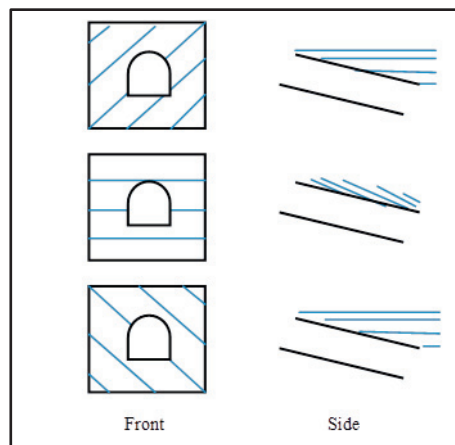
Geological structure and tunnel orientation for support recommendation on Ramp Down, Pongkor underground mine (Sulistianto et al., 2009).
